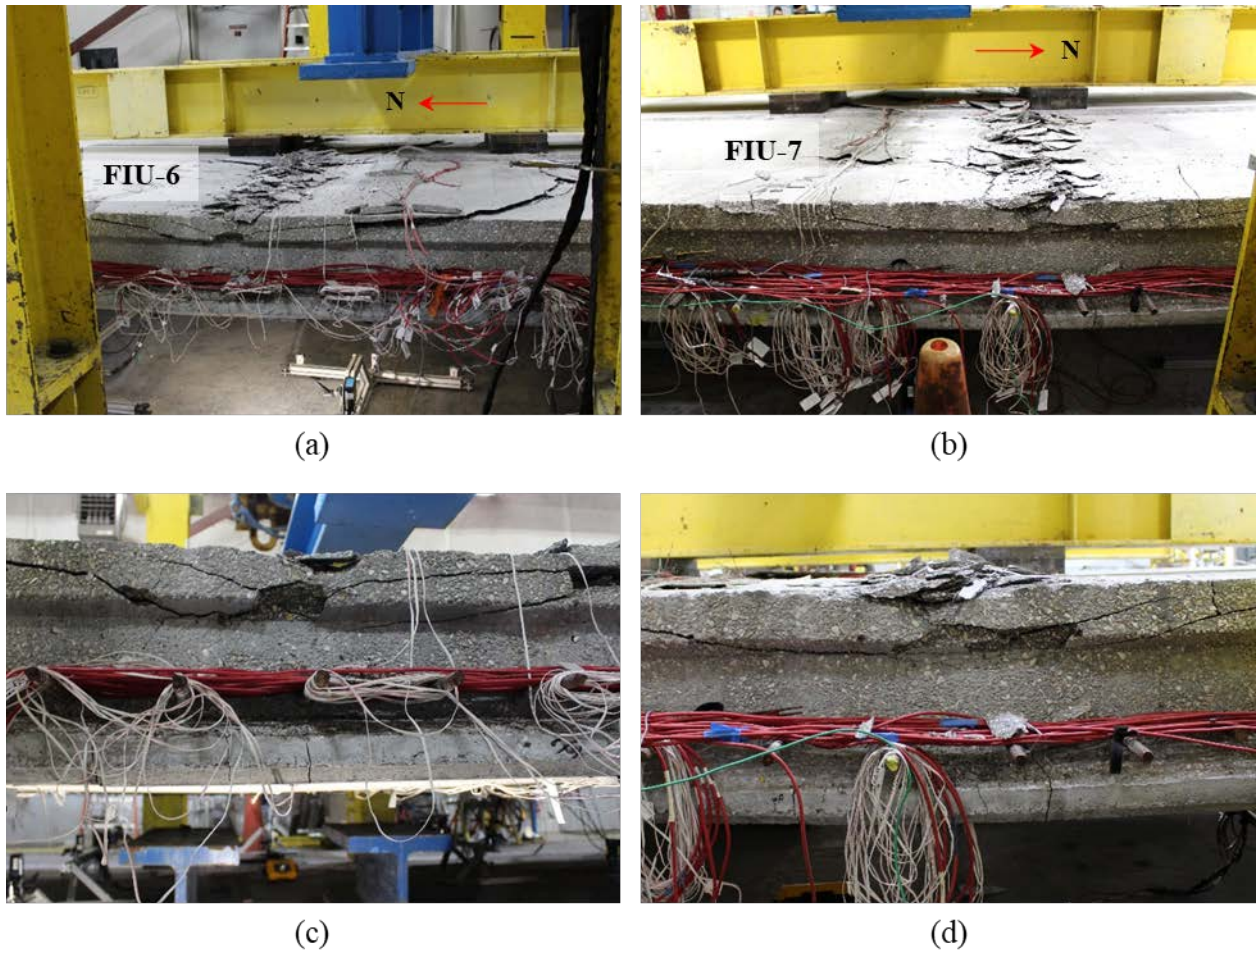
Crushing of FIU-6/3/8/7 concrete at failure for LC 4-5: (a) overview and (b) crushing of precast section and UHPC joint (FIU 6-3)
